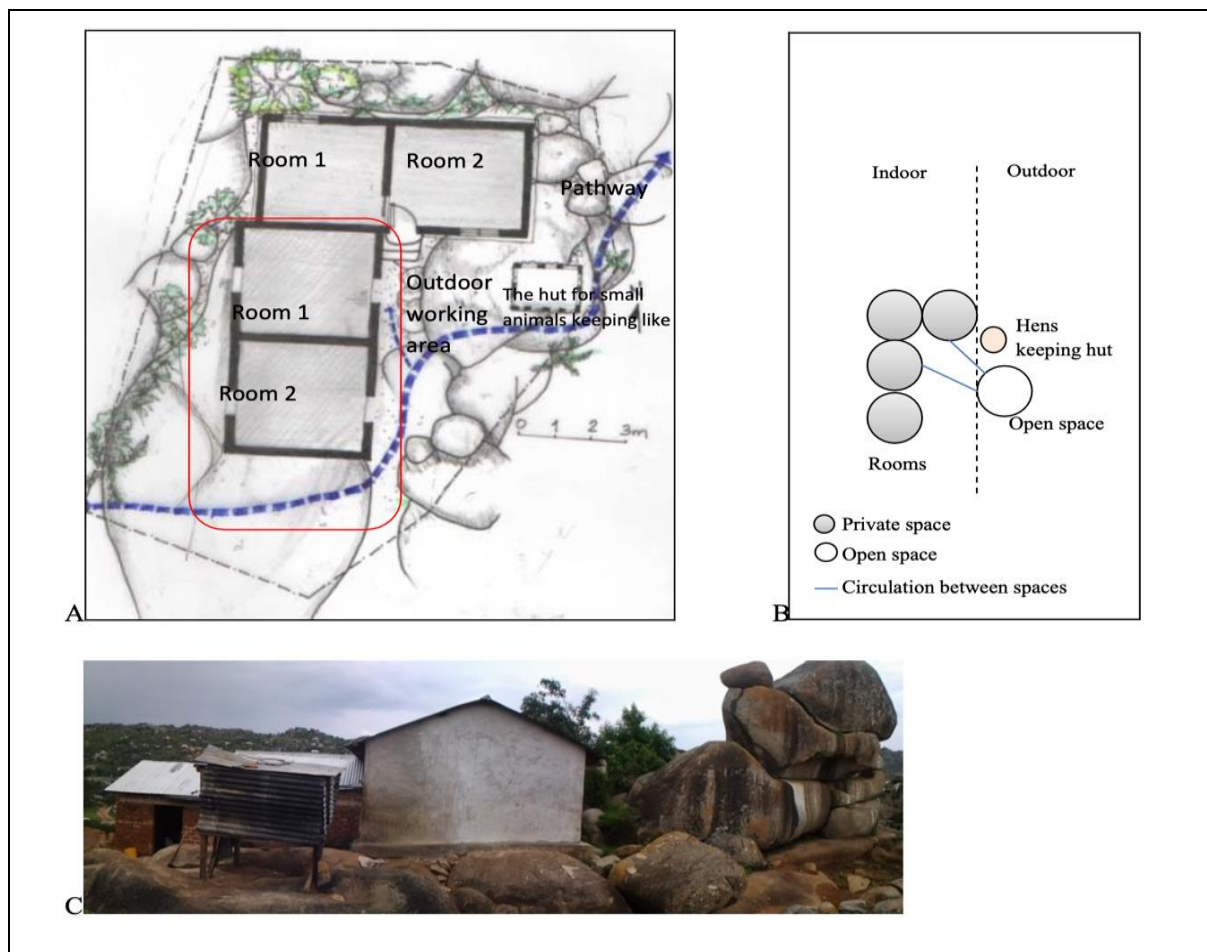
A, B and C: L-Shape house type, the circled in the house plan is new part of the house as it can be seen in the image above the structure with burnt bricks without plaster. Author's fieldwork study 2025
